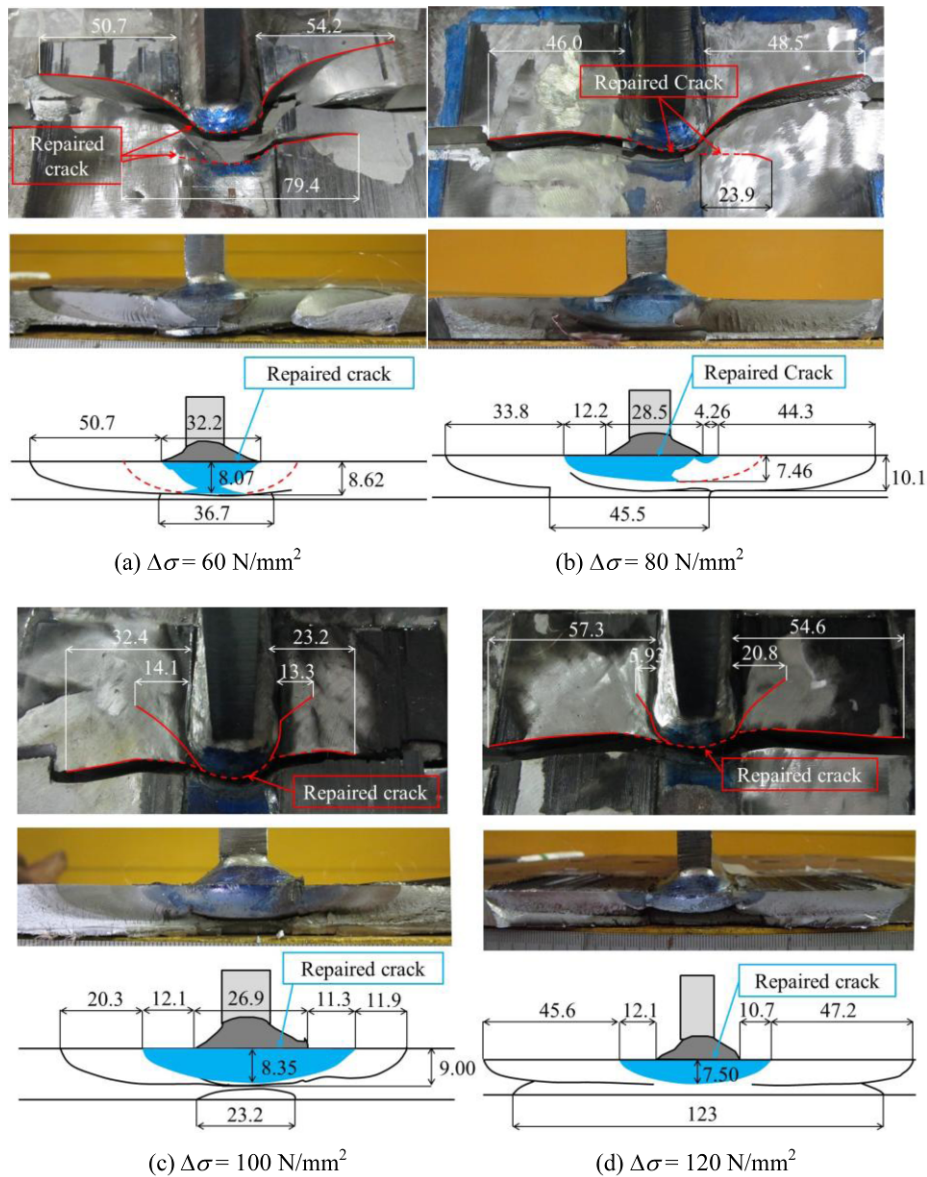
Fracture surface of the  $N_{10}$ +CFRP specimen.
